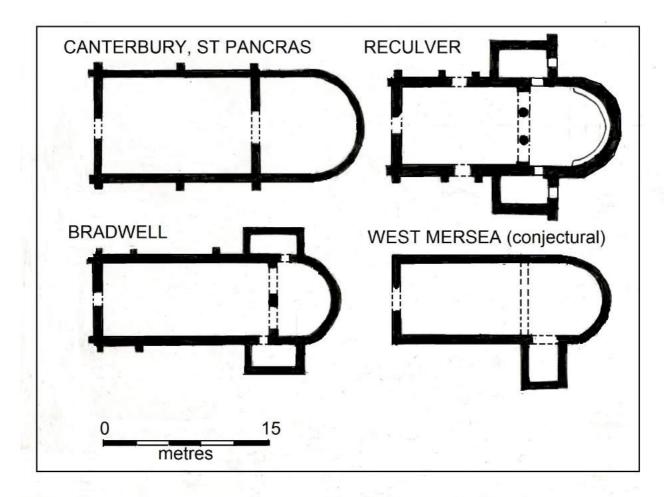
Comparative reconstructed plans of West Mersea and the primary phases of the 7th century churches of St Pancras (Canterbury), Reculver and Bradwell-on-Sea (St Pancras, Reculver and Bradwell adapted from Taylor and Taylor 1965 with modifications)
